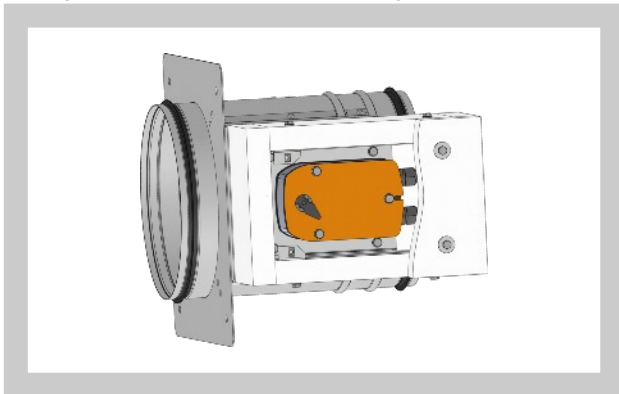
Actuating mechanism BELIMO BLE 24(-ST)
